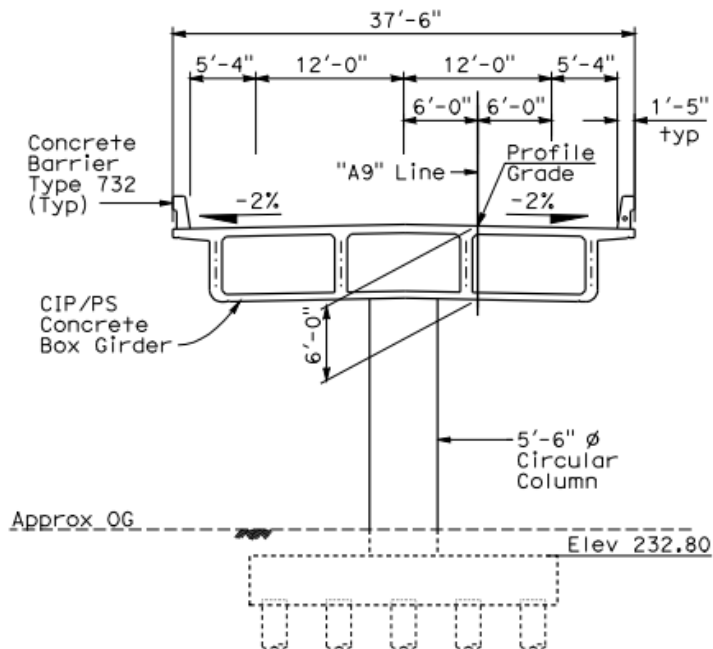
Cross-Section detail of OSB2 bridge deck (Caltrans)
